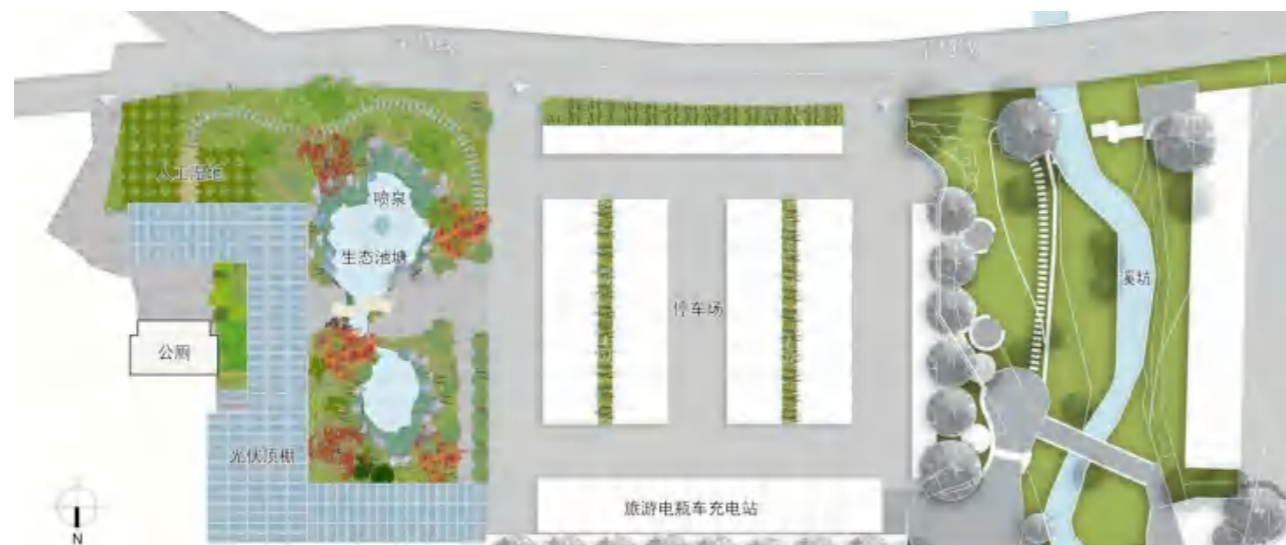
Layout of the Eco Garden of Maa Village
